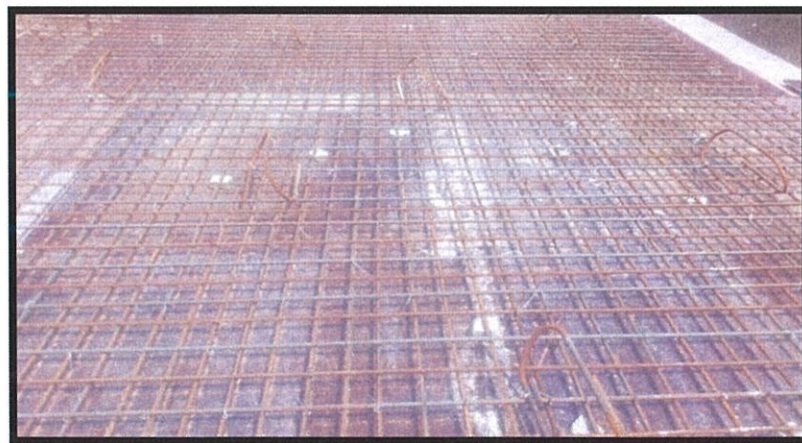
The steel chair was installed to create a support for top reinforcement bars
